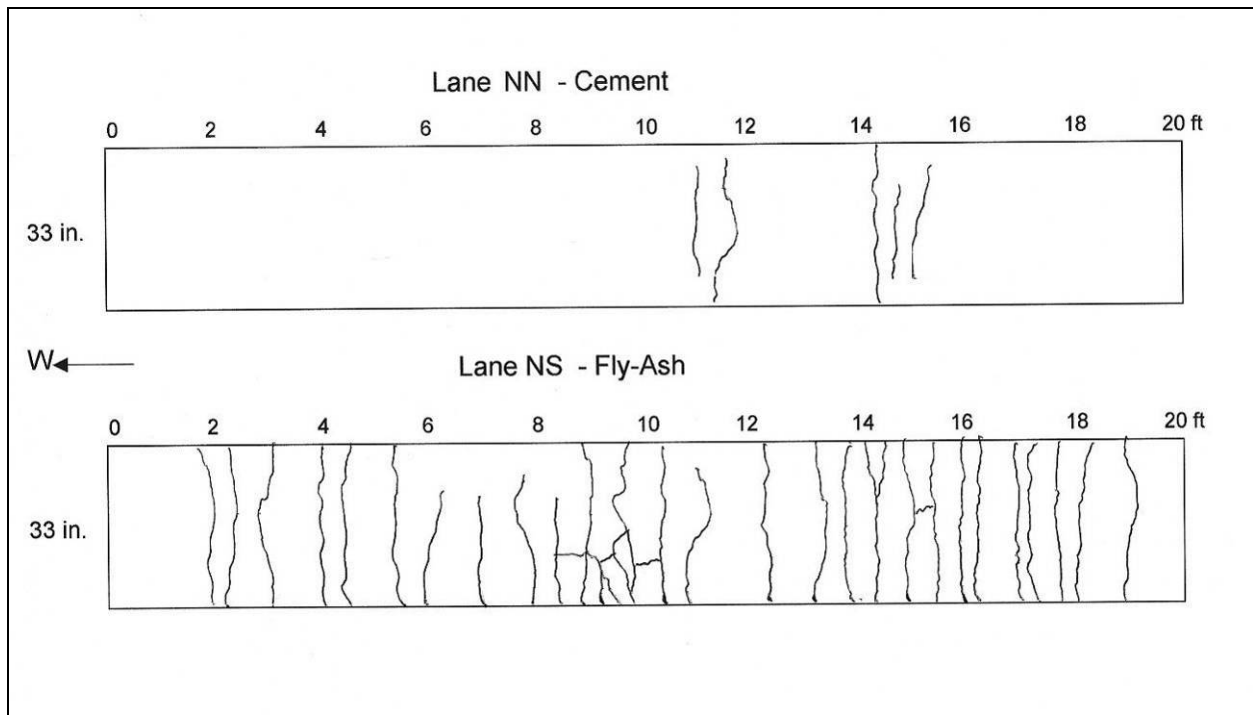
Surface crack pattern at 2,000,000 load cycles
